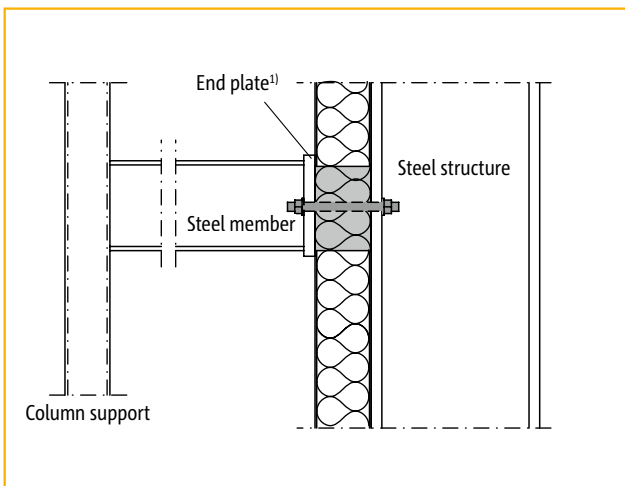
Schöck Isokorb® module, type KST-QST/KST-ZQST for supported steel structures
